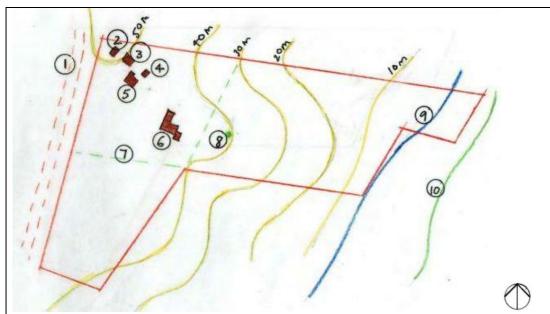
Site plan of the Mount Omei property, drawn by Geoff Ashley, 2016. Key: 1) Leacocks Lane entrance to Mount Omei 2) 1959 Garage 3) 1946 Garage/studio 4) 1960 Workshop 5) 1946 Former laboratory-gallery 6) 1947-48 House 7) Fencing around house precinct 8) Pond overlooking slopes 9) Glenfield Creek 10) Path/cycleway (Ashley, 2016, p25 and Annexure A).
